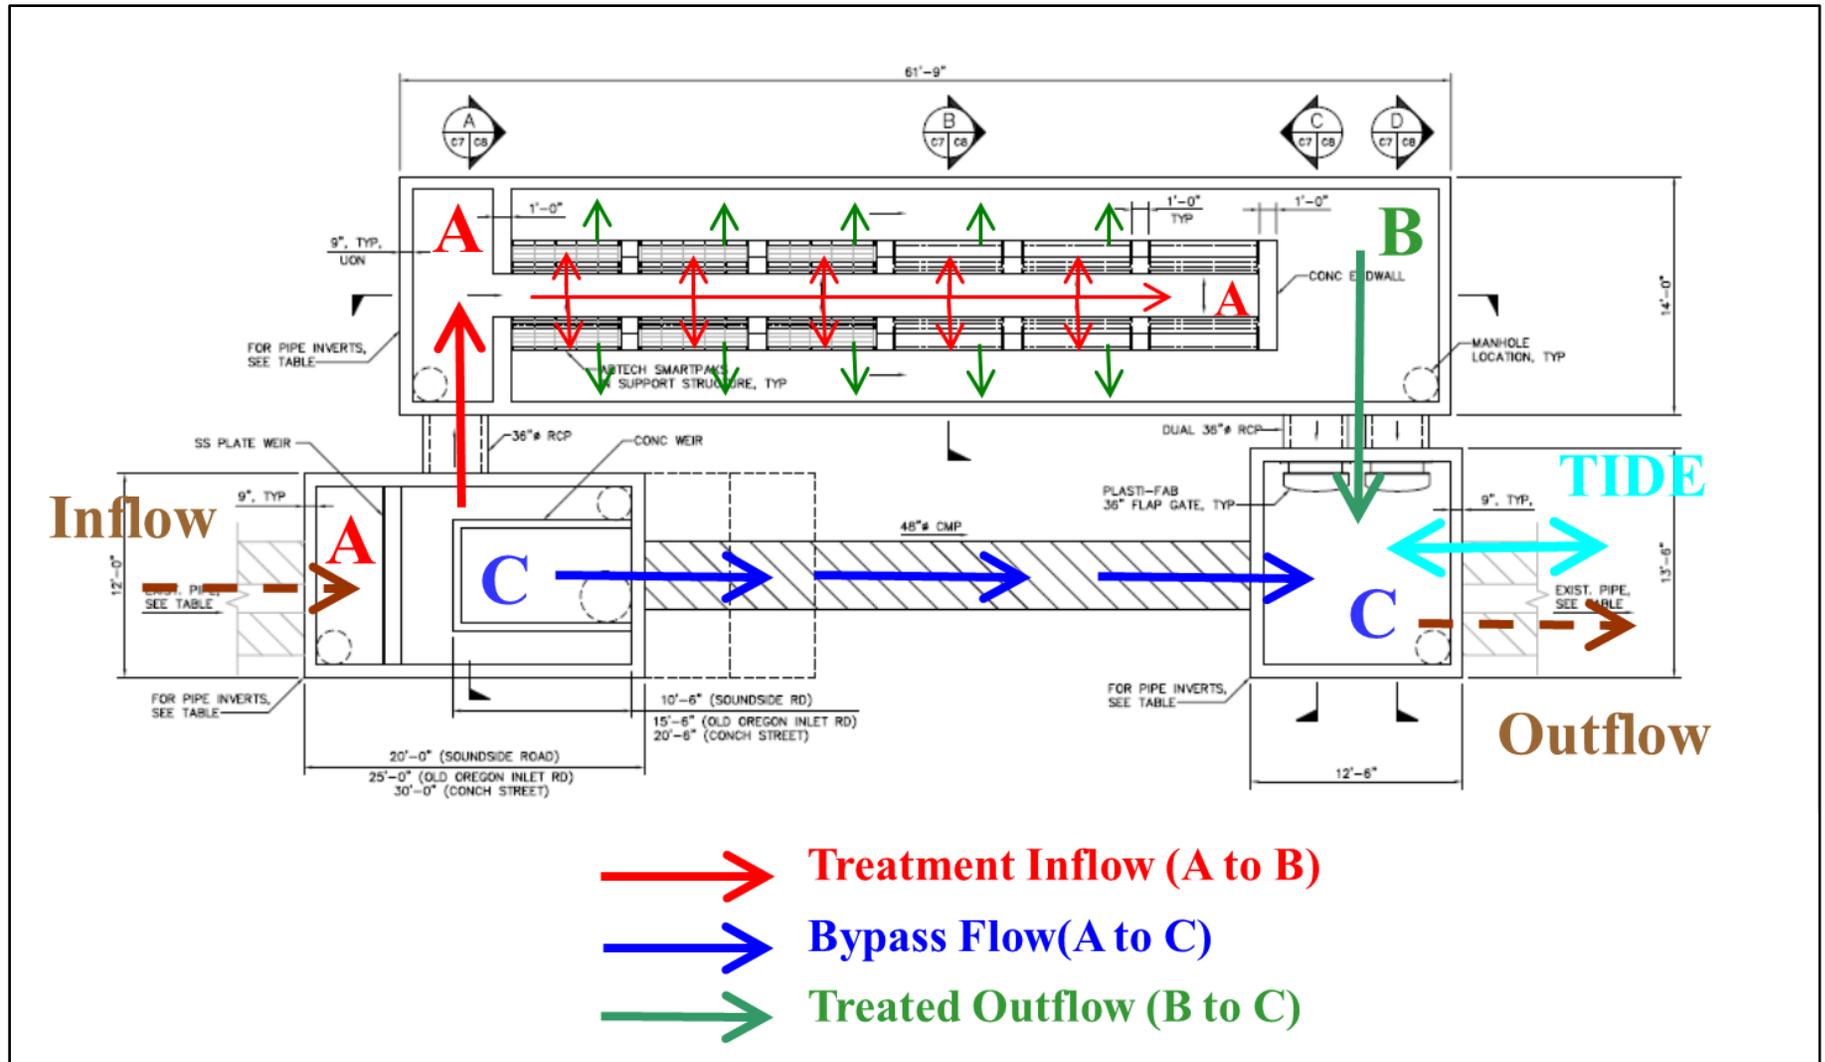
Plan View of Conch Street BMP Design with Routing Model Illustrated
